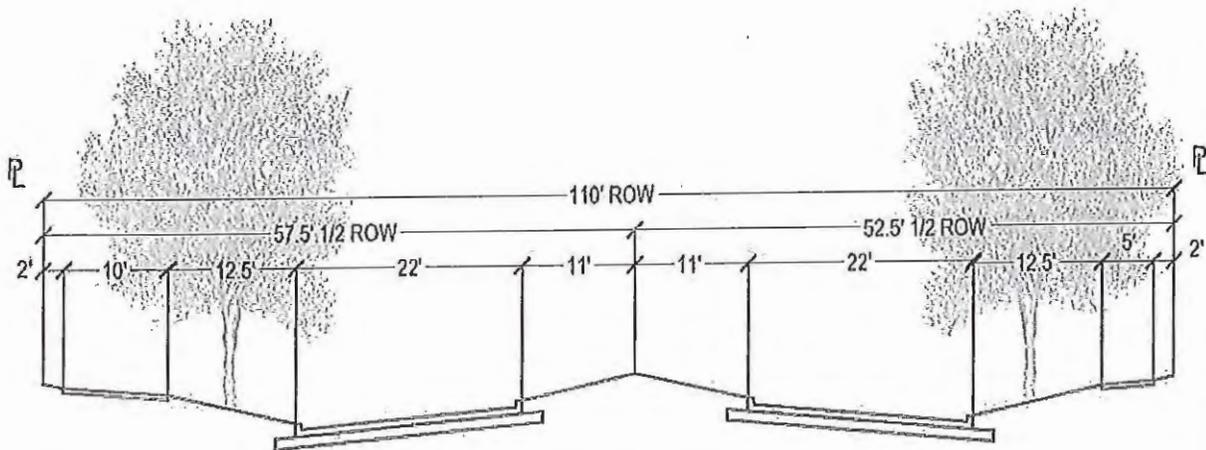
NE BEAVERBROOKE BOULEVARD - LOOKING EAST
